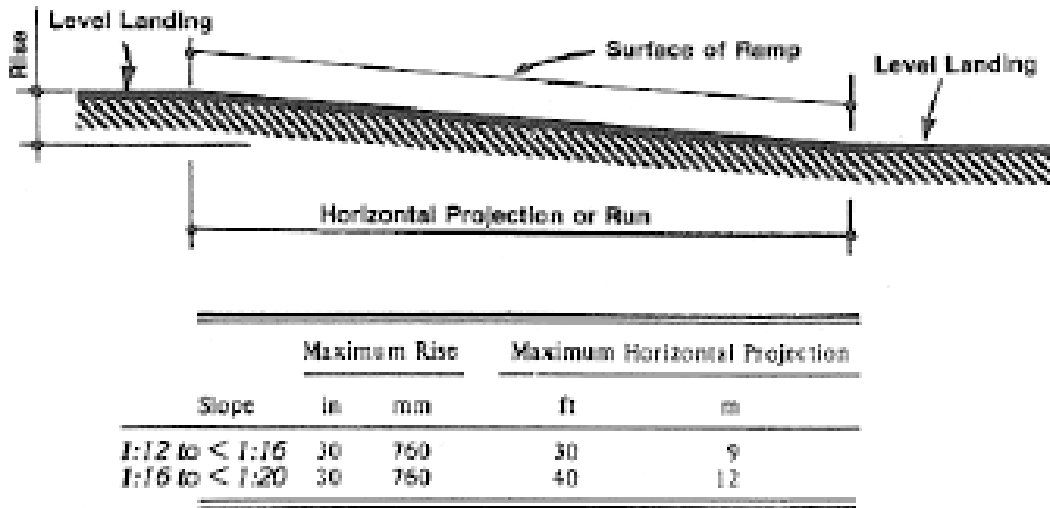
Single Ramp Run and Sample Ramp Dimensions
